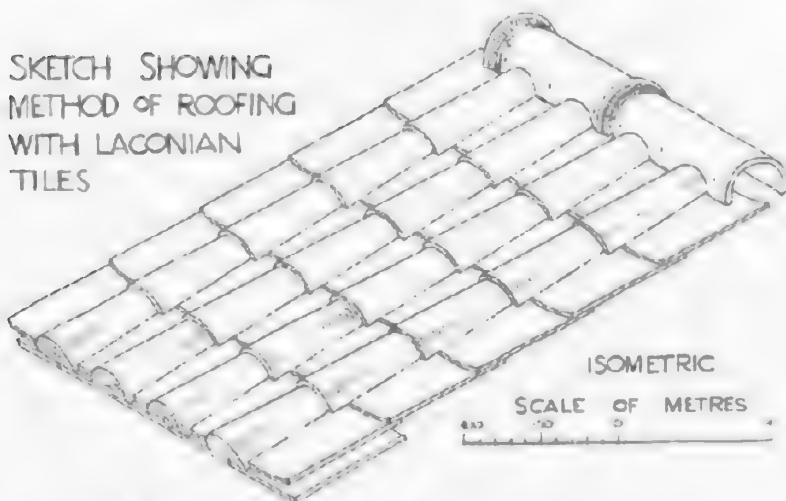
RECONSTRUCTION OF TEMPLE ROOFING SYSTEM.
